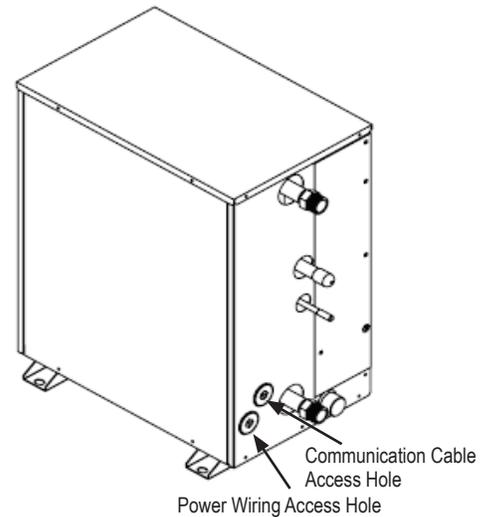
Hydro Kit Wiring / Cable Path and Terminal Location.
